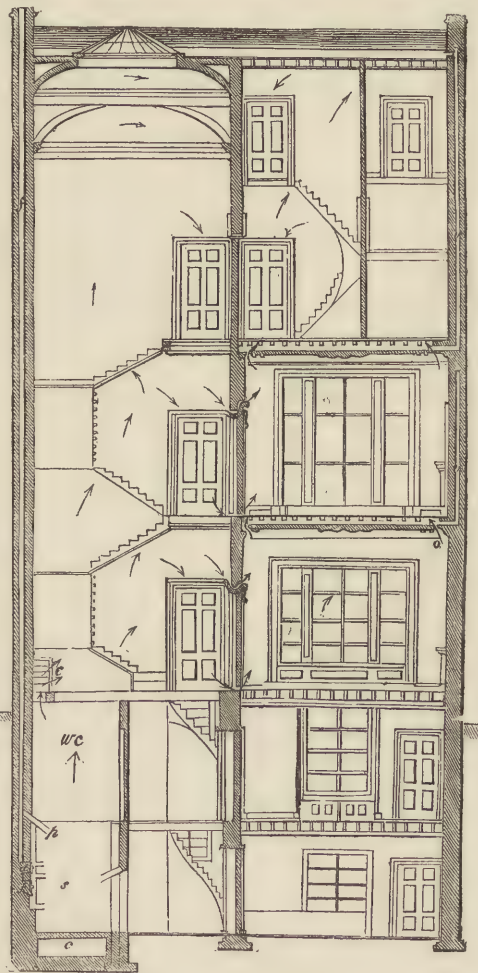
WARMING AND VENTILATING ARRANGEMENTS IN SIR JOHN ROBINSON'S HOUSE.
